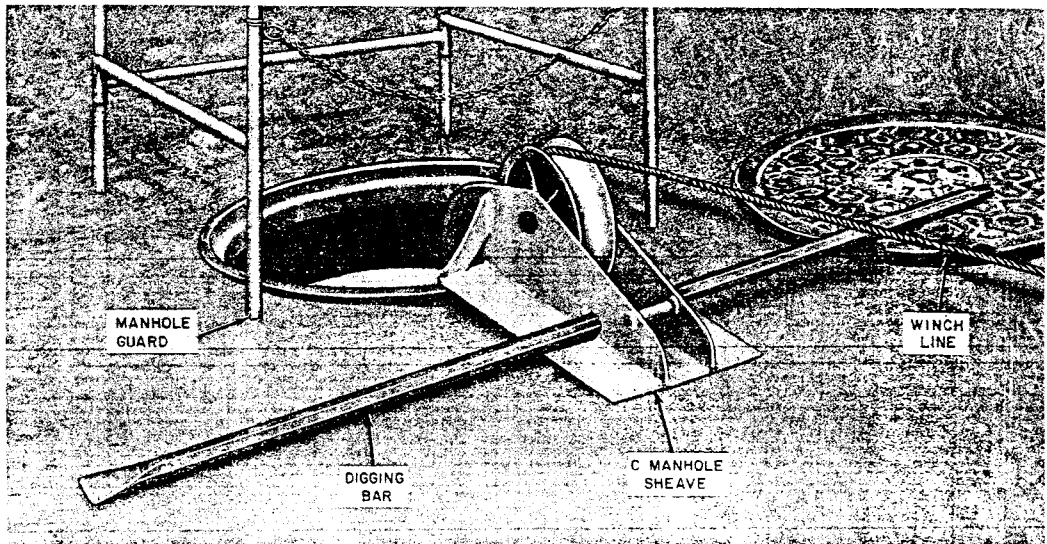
Pulling Arrangement Using C Manhole Sheave
